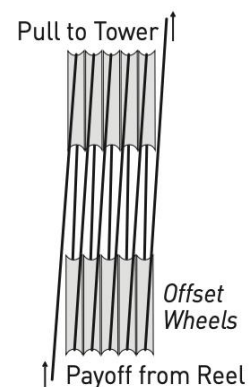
Offset Multi-Groove Bullwheel Tensioner
